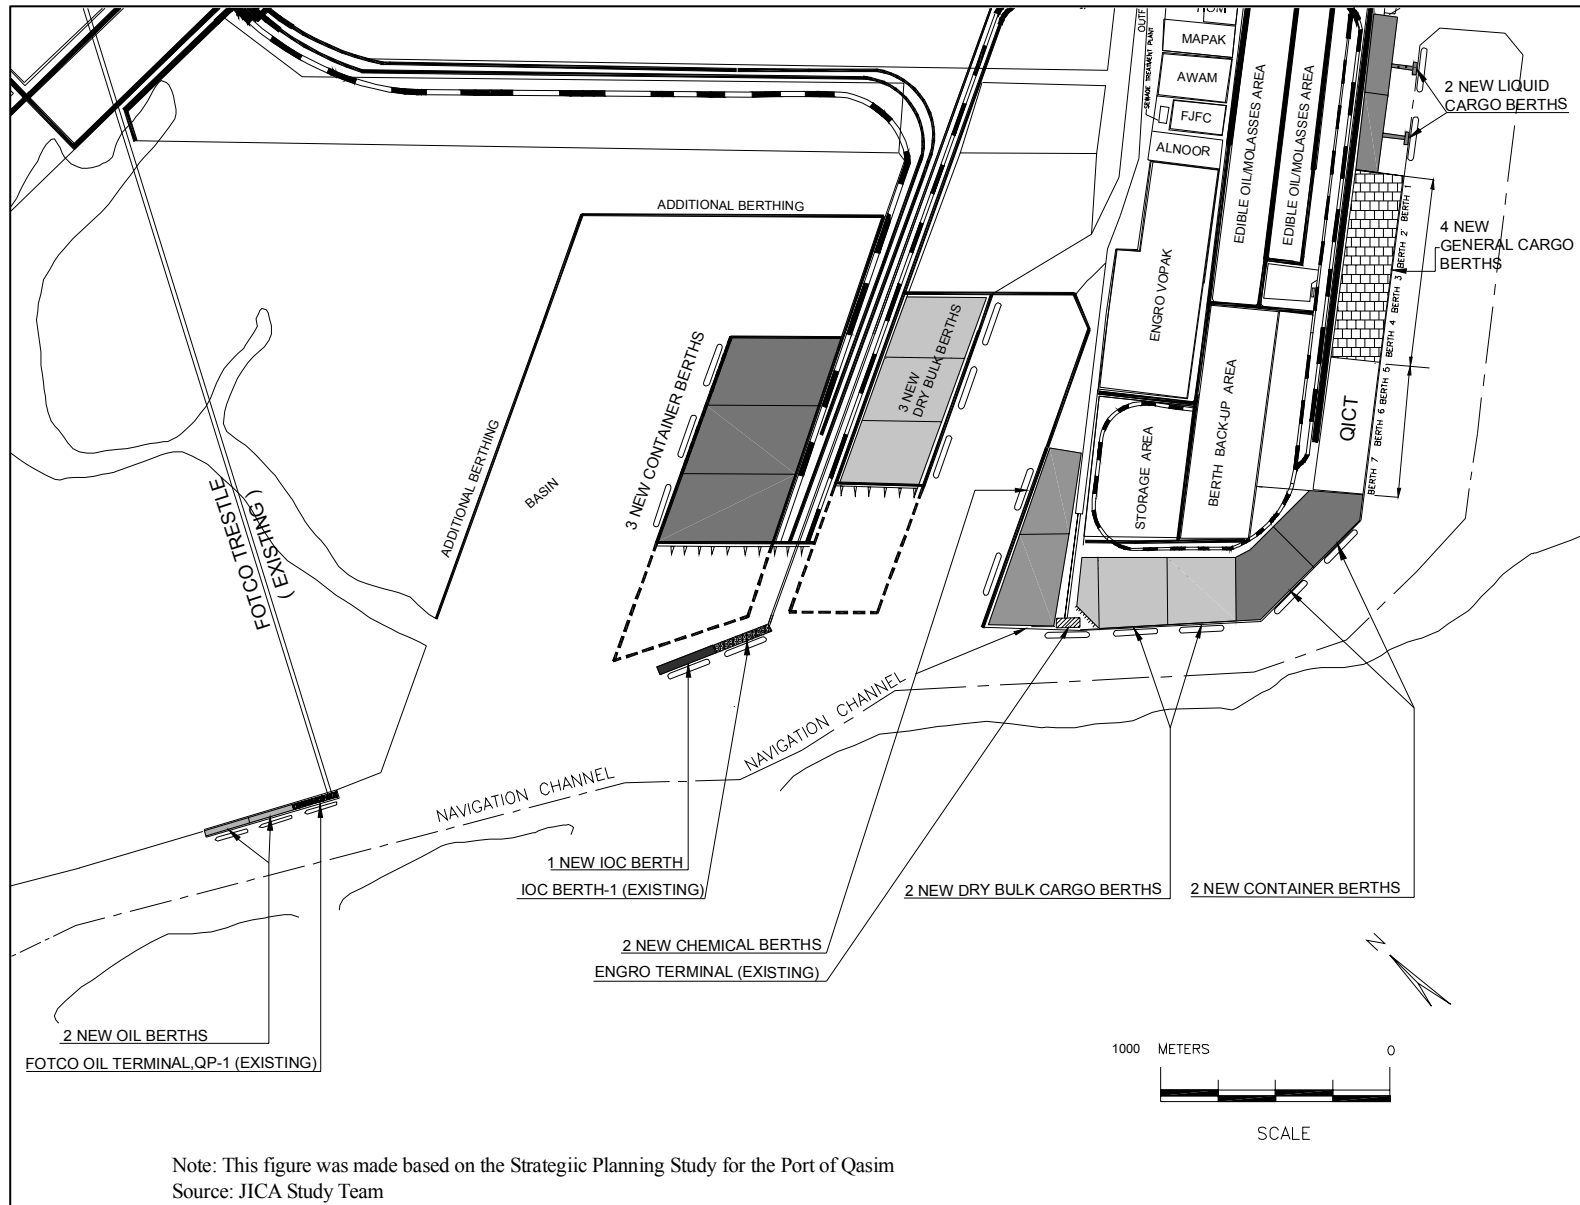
Layout Plan at Qasim Port (Master Plan)
